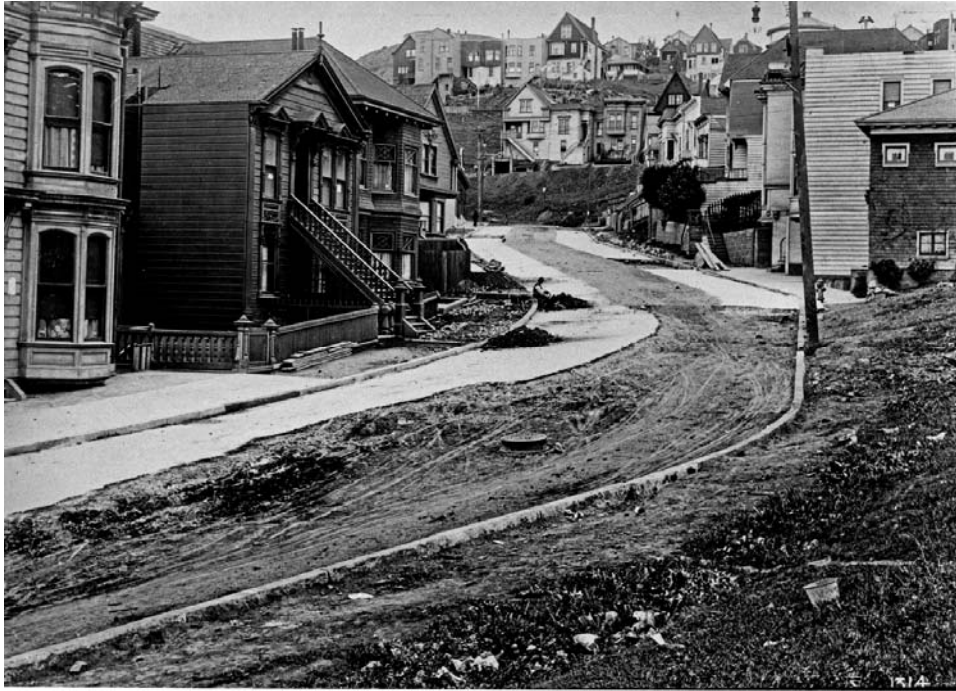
1912 view looking west on Corbett in the 200 block showing infrastructure systems: stone curbs, partial concrete sidewalks, partial street paving in macadam, manhole covers for sewers, streetlights. (Courtesy of Western Neighborhoods Project)
